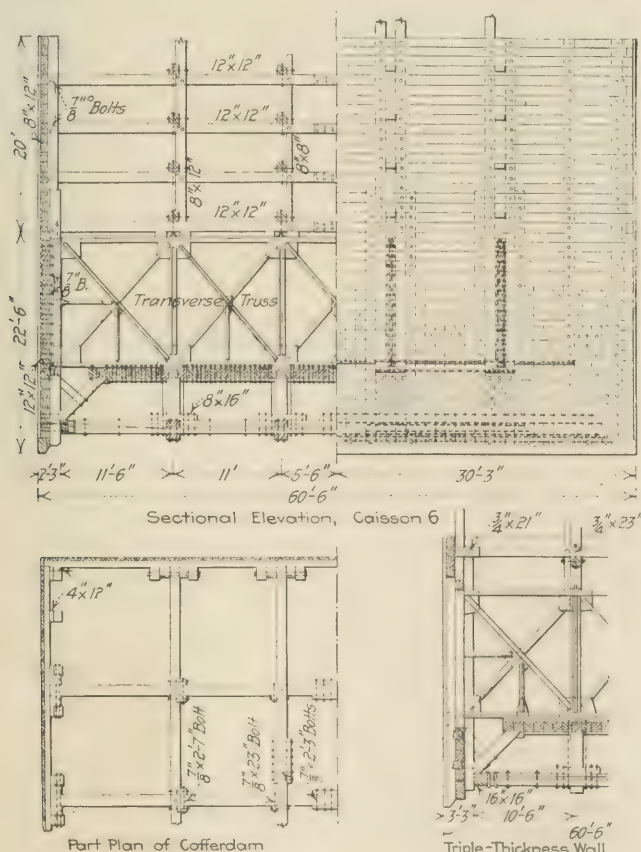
CAISSON OF PIER 6, AND SECTION SHOWING TRIPLE WALL FRAMING IN CAISSONS
